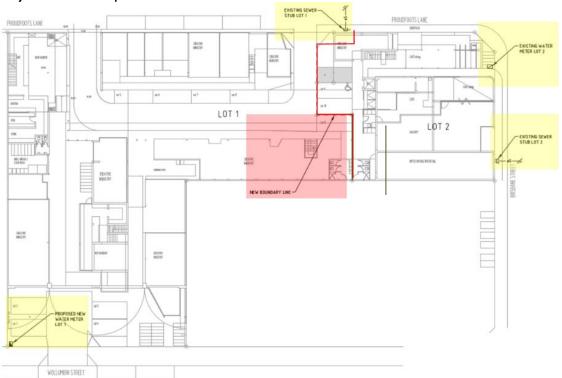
Preliminary Hydraulic (Drainage and Water) Plans (prepared by Sedgman Engineering dated 17 May 2018)
